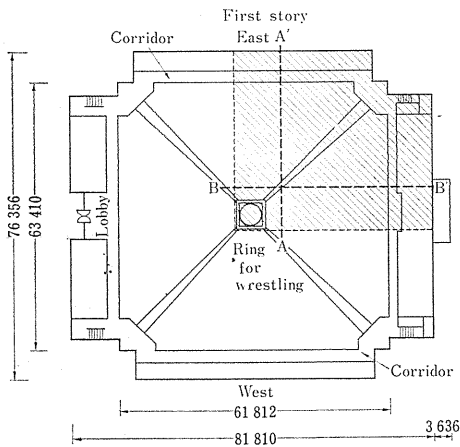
Plan of the Kuramae-Kokugikan (mm).
